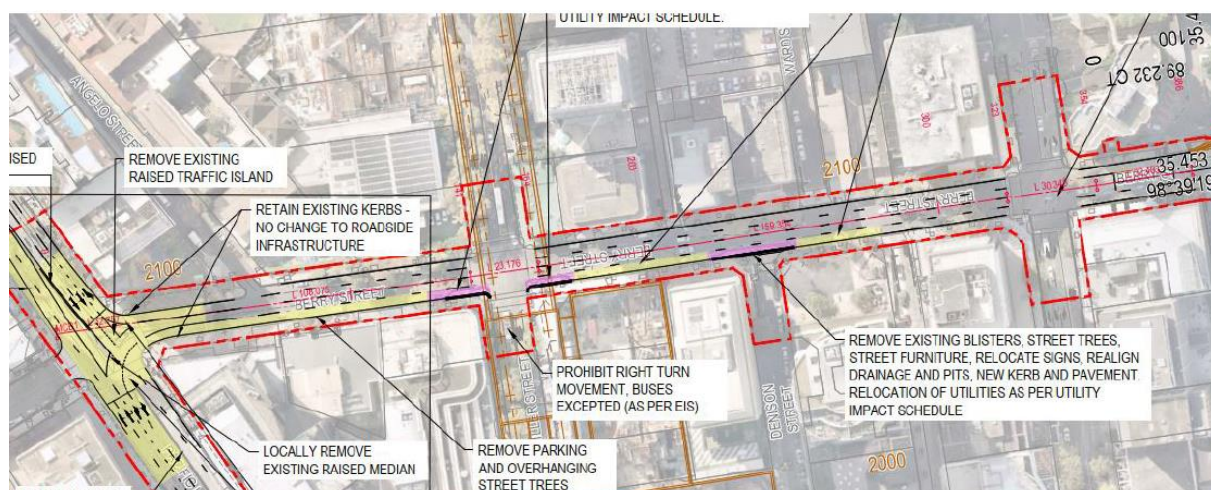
Alterations proposed to Berry St by the WHT project will prevent the improvements to walking, cycling and landscaping that are key to the successful operation of the Metro and other projects (Source: Acciona)
